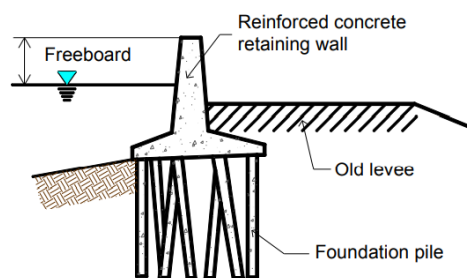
Flood well - Self-Standing Retaining Wall [31,1]
